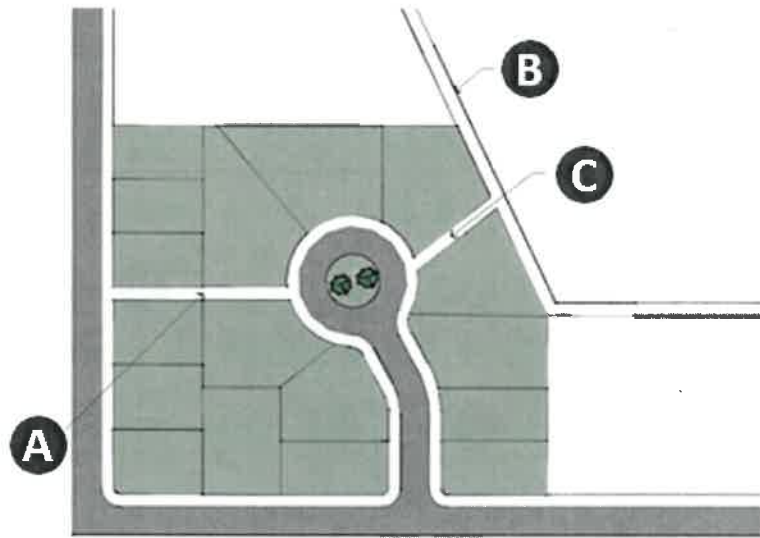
FIGURE NOTES: A = Mid-Block Pedestrian Access B = Pedestrian Access to Common Facility (Sidewalk or Trail) C = Cul-de-Sac Pedestrian Access
